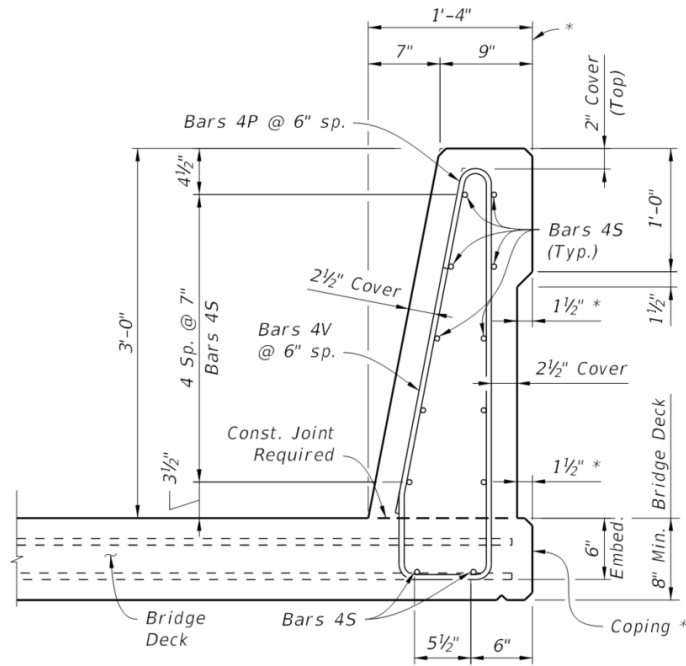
FDOT 36-in. single-slope traffic railing (FDOT 2020a)
